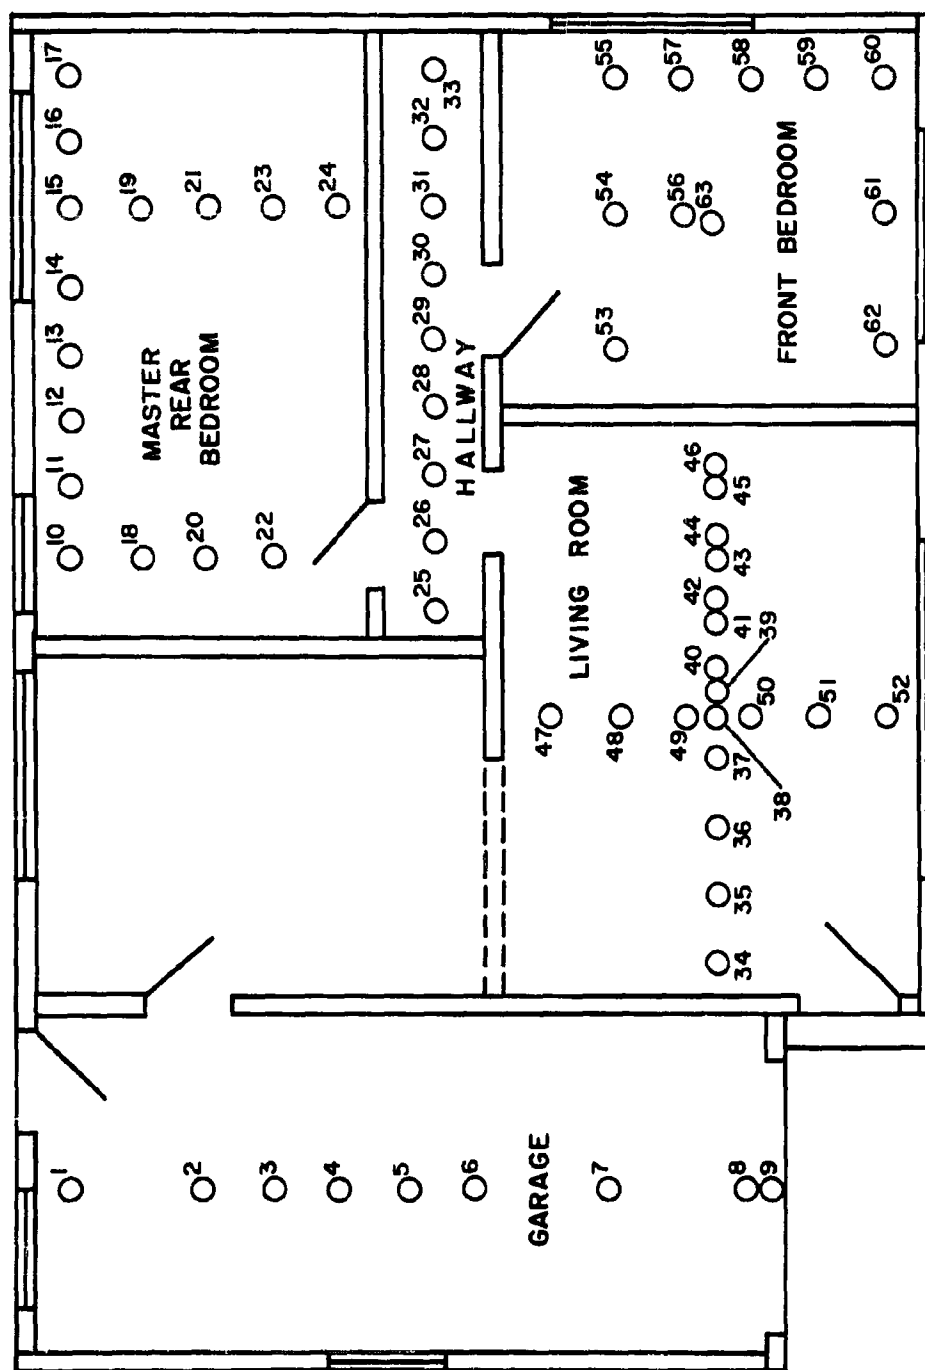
Floor Plan and Dosimeter Locations for the Precast Concrete Model Ranch House
